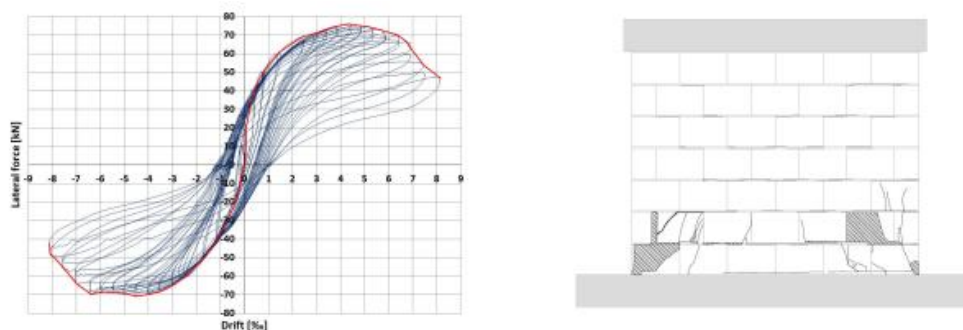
hysteresis loop (left) and cracking pattern at the end of the test (right) for WUR wall. By: Devaux.
